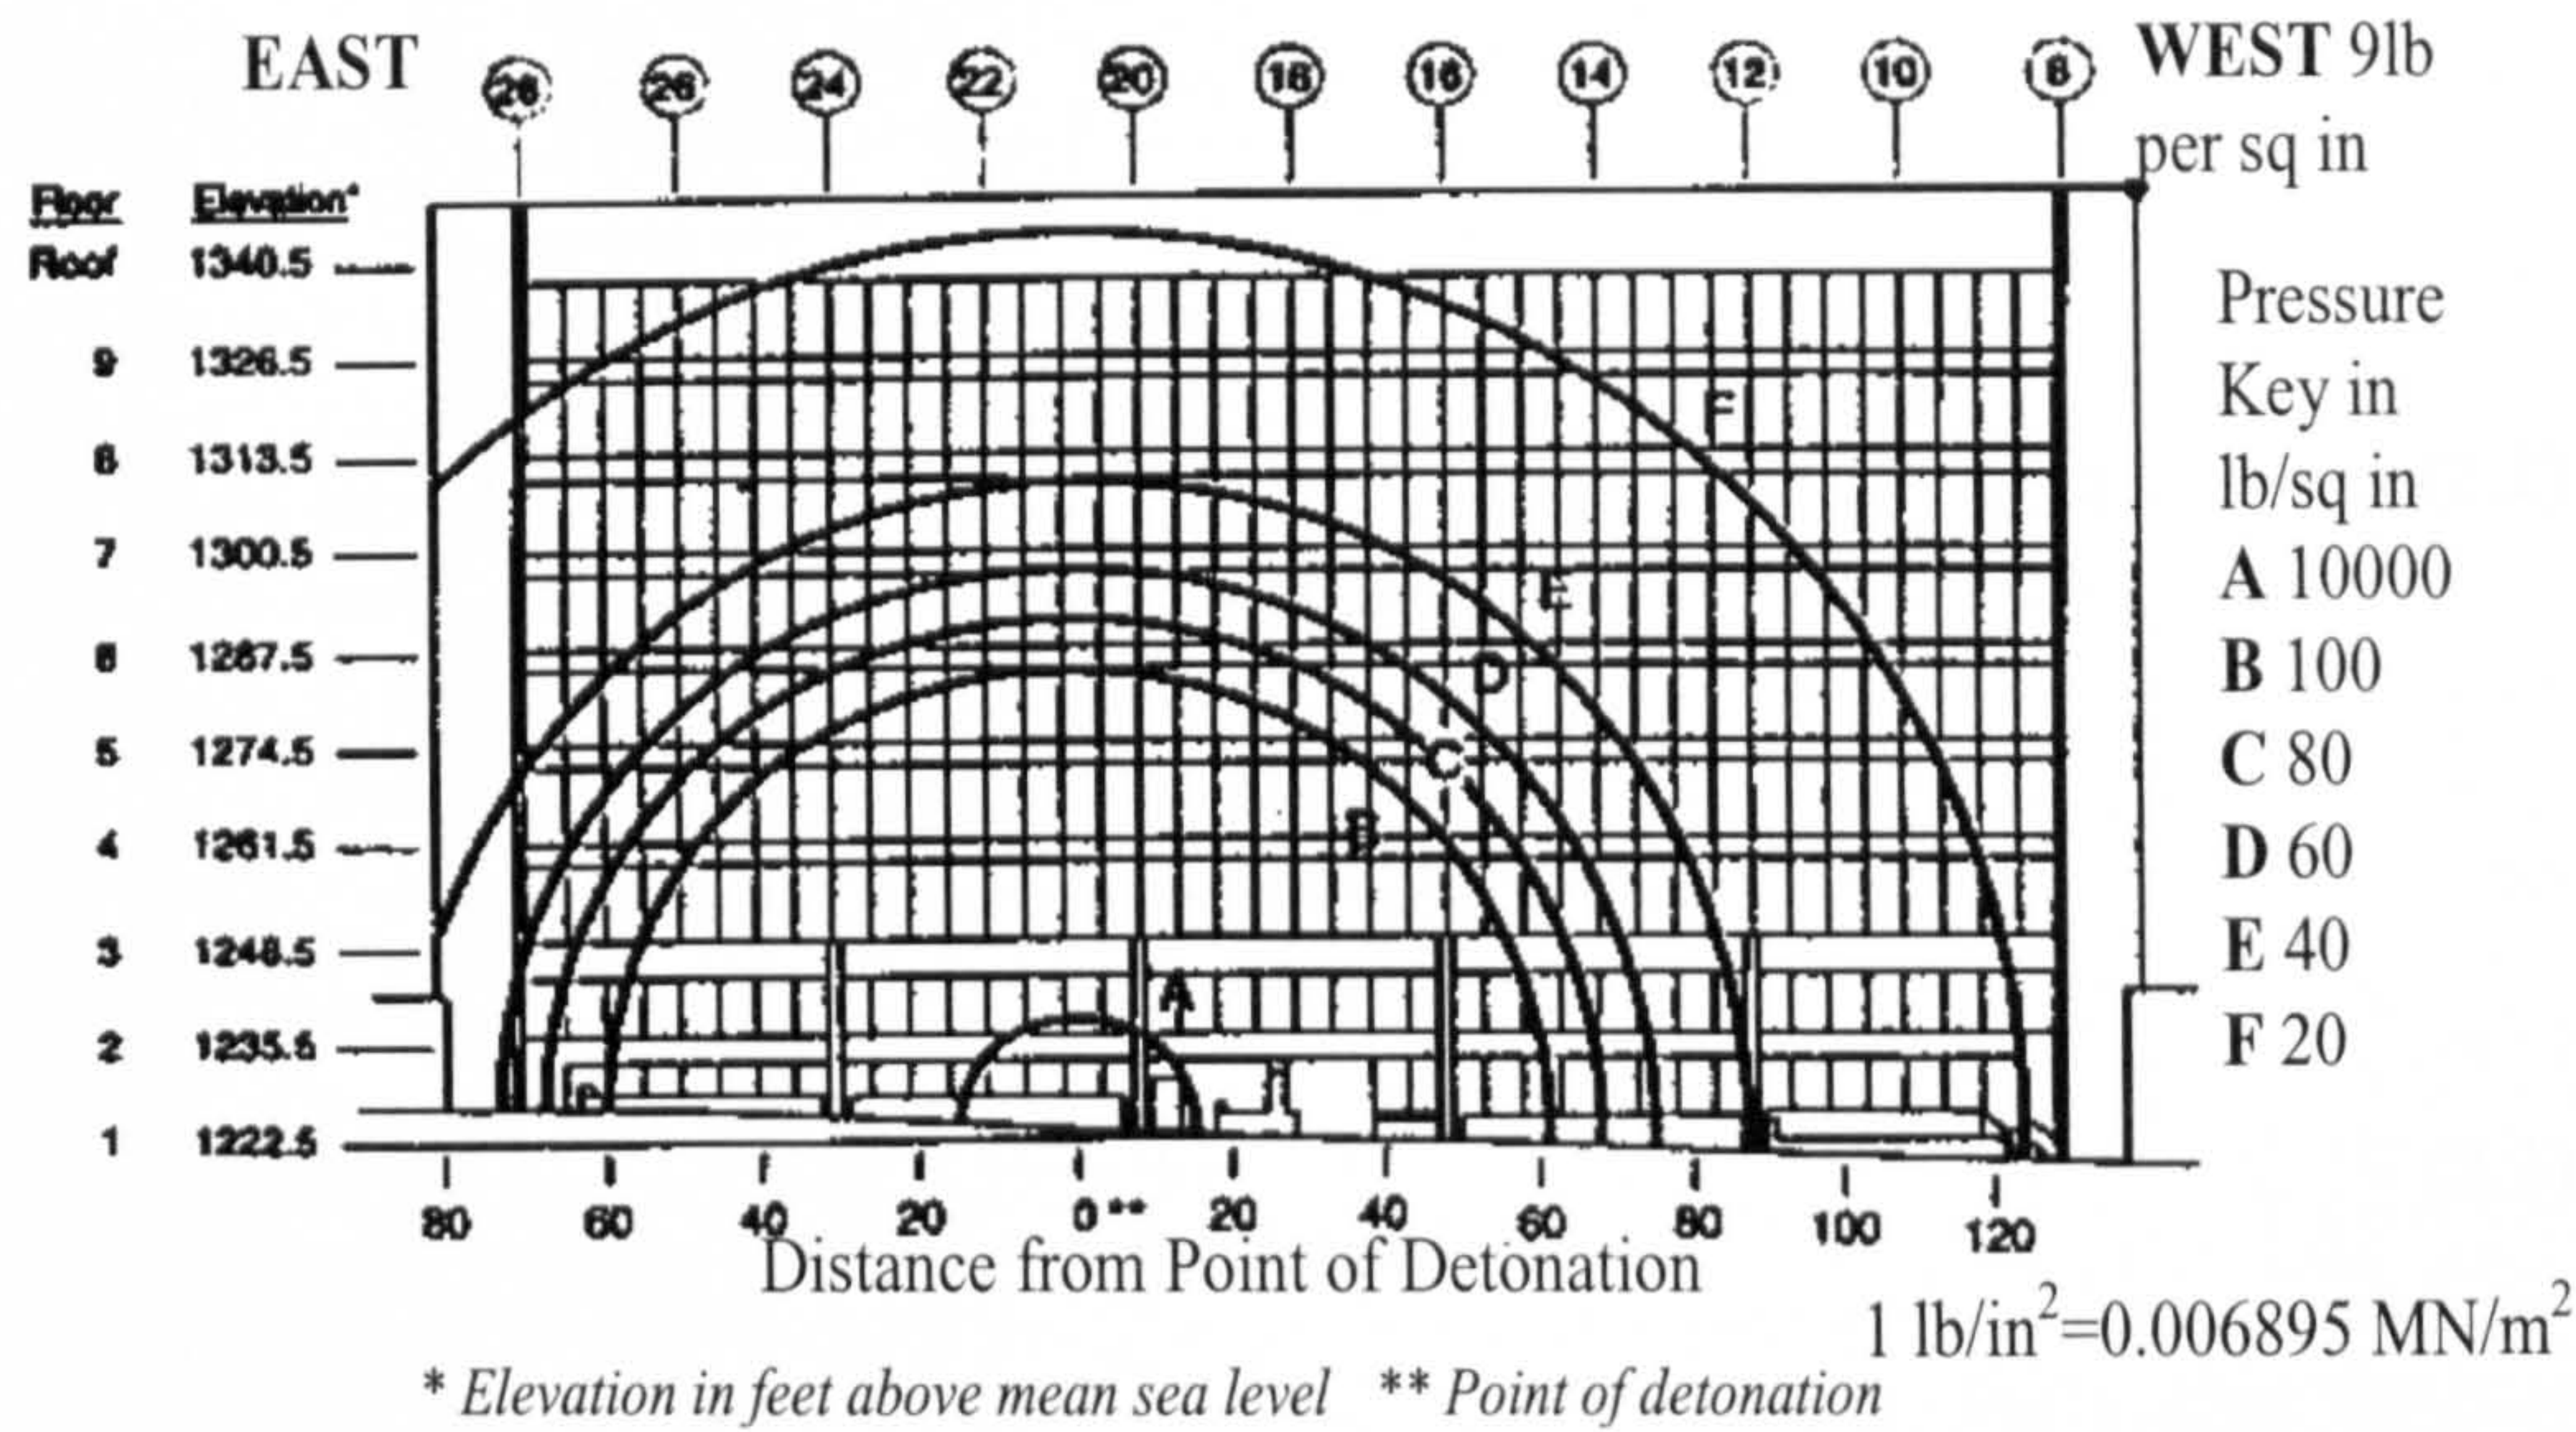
Peak overpressures on the North elevation of the Murrah Building
